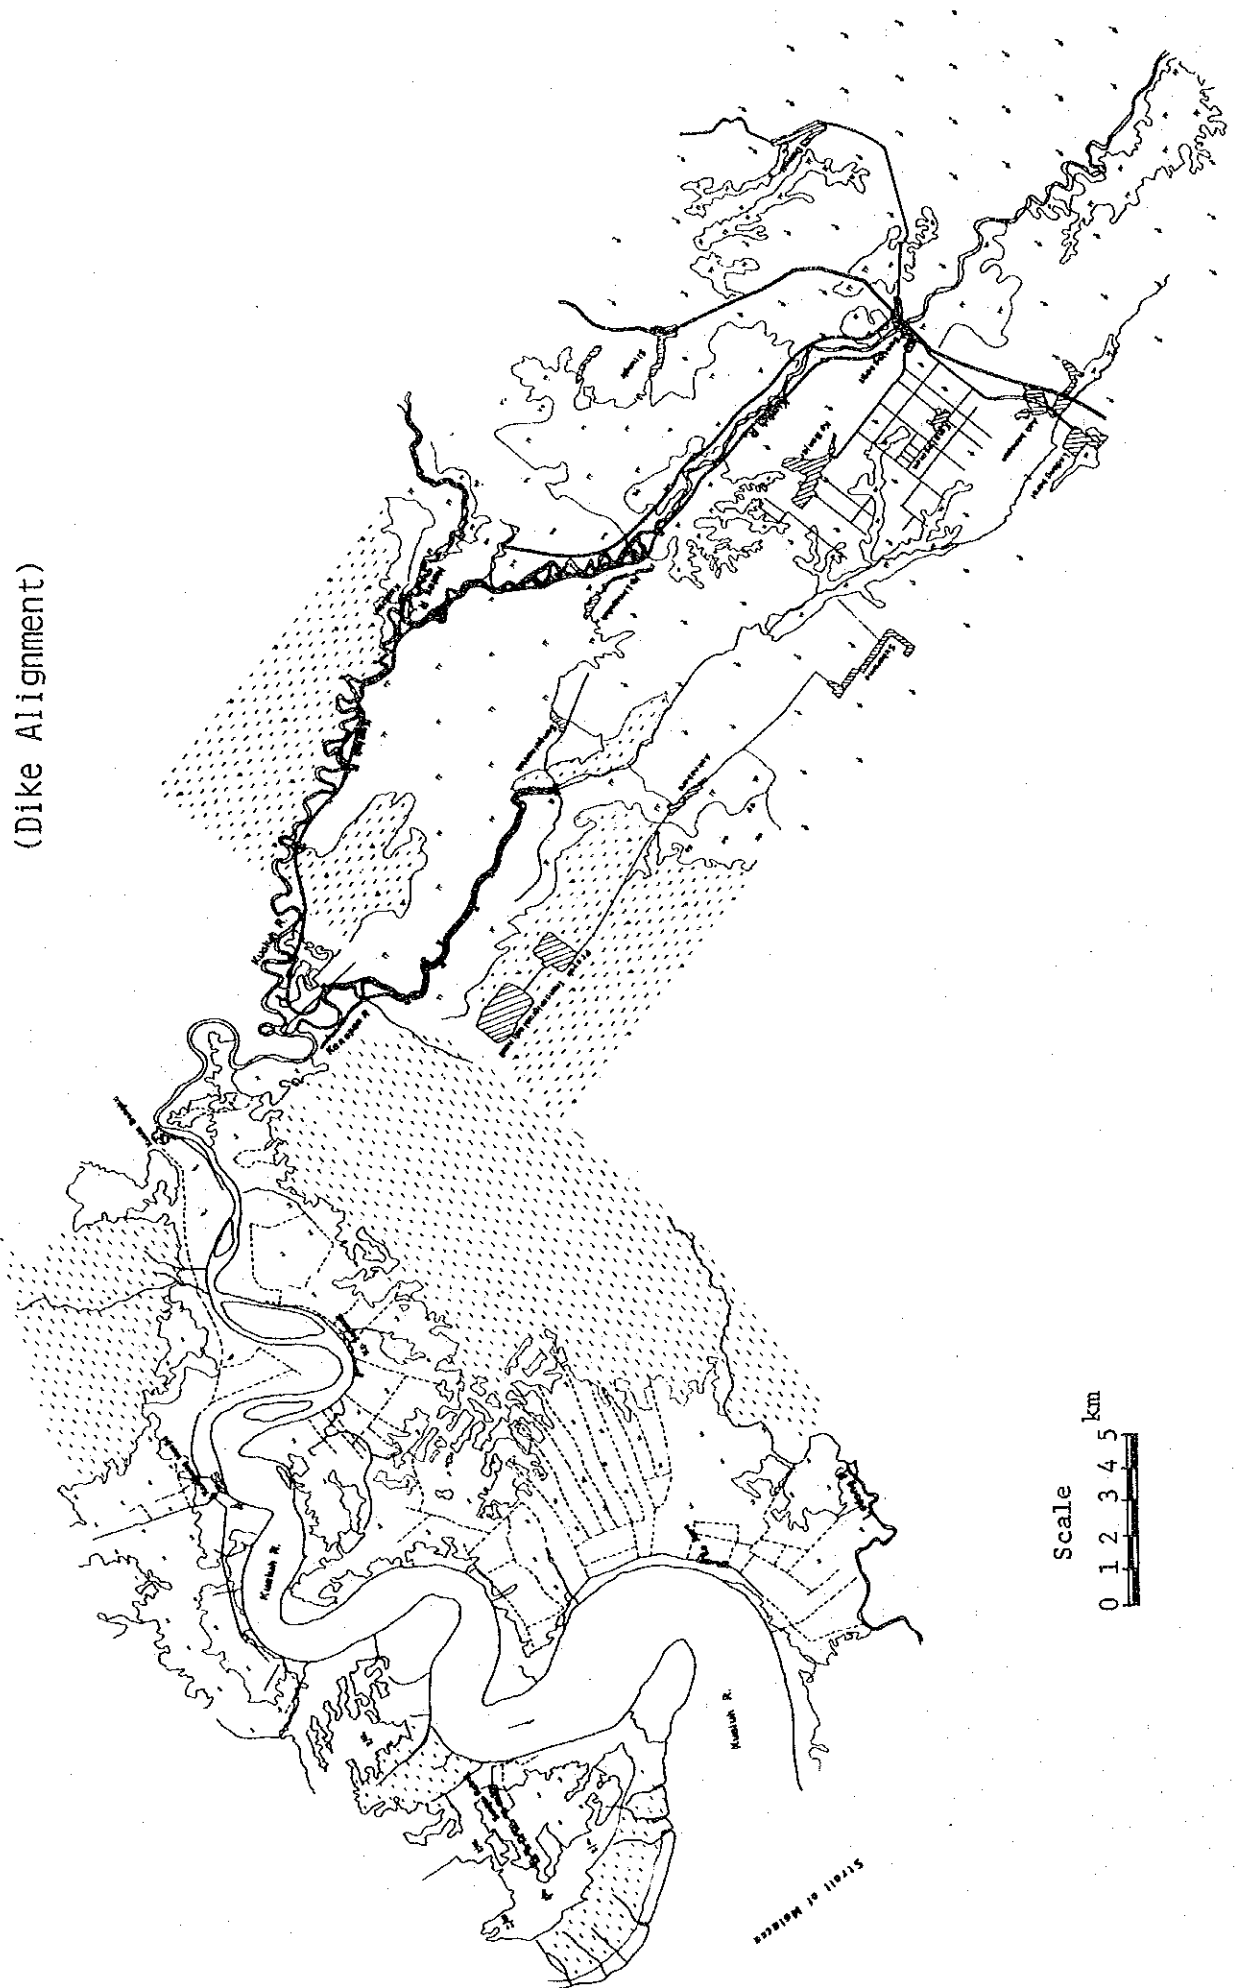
Proposed Long-Term Plan of Kualuh River (2/3)
